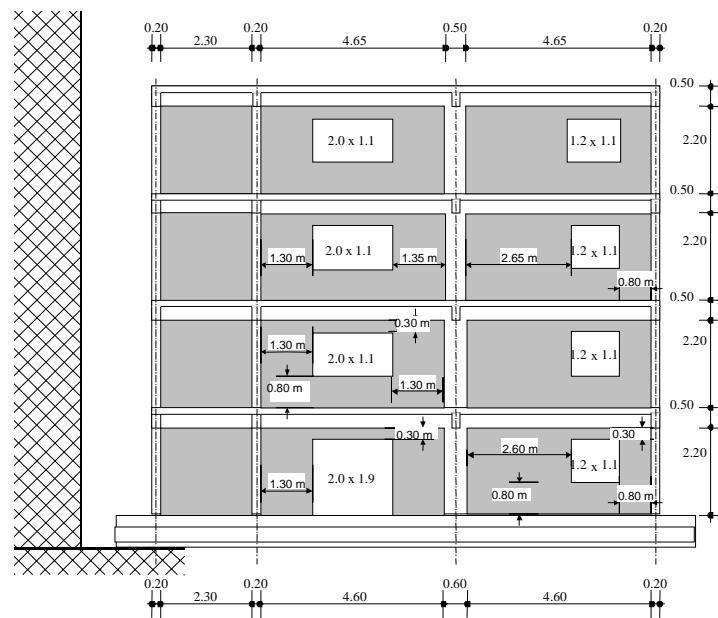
Full scale 4 Storey Reinforced Concrete Frame tested at Ispra (configuration with masonry infills)
